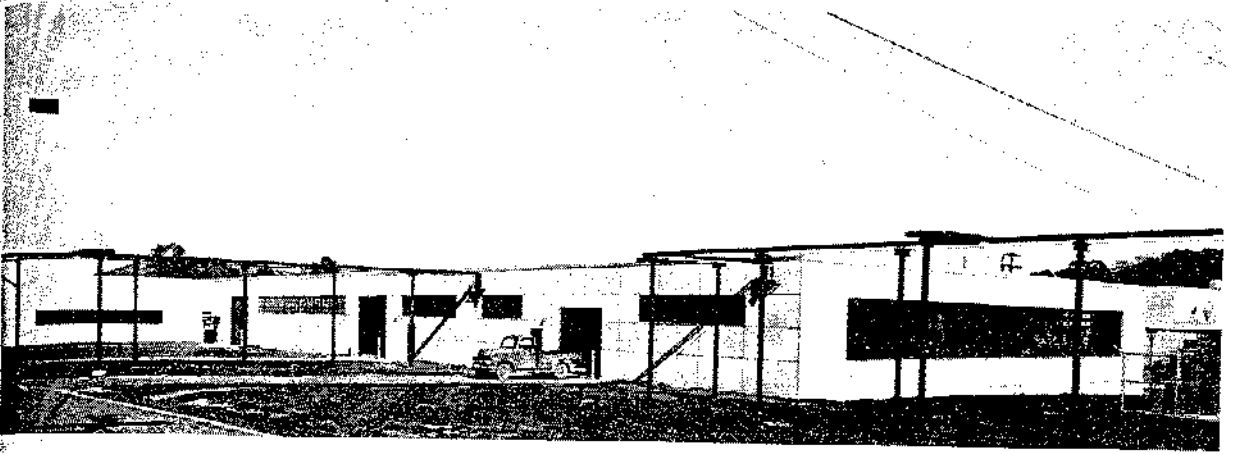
Building 3 housing shop, warehouse, experimental oil well, and heavy-duty equipment.
